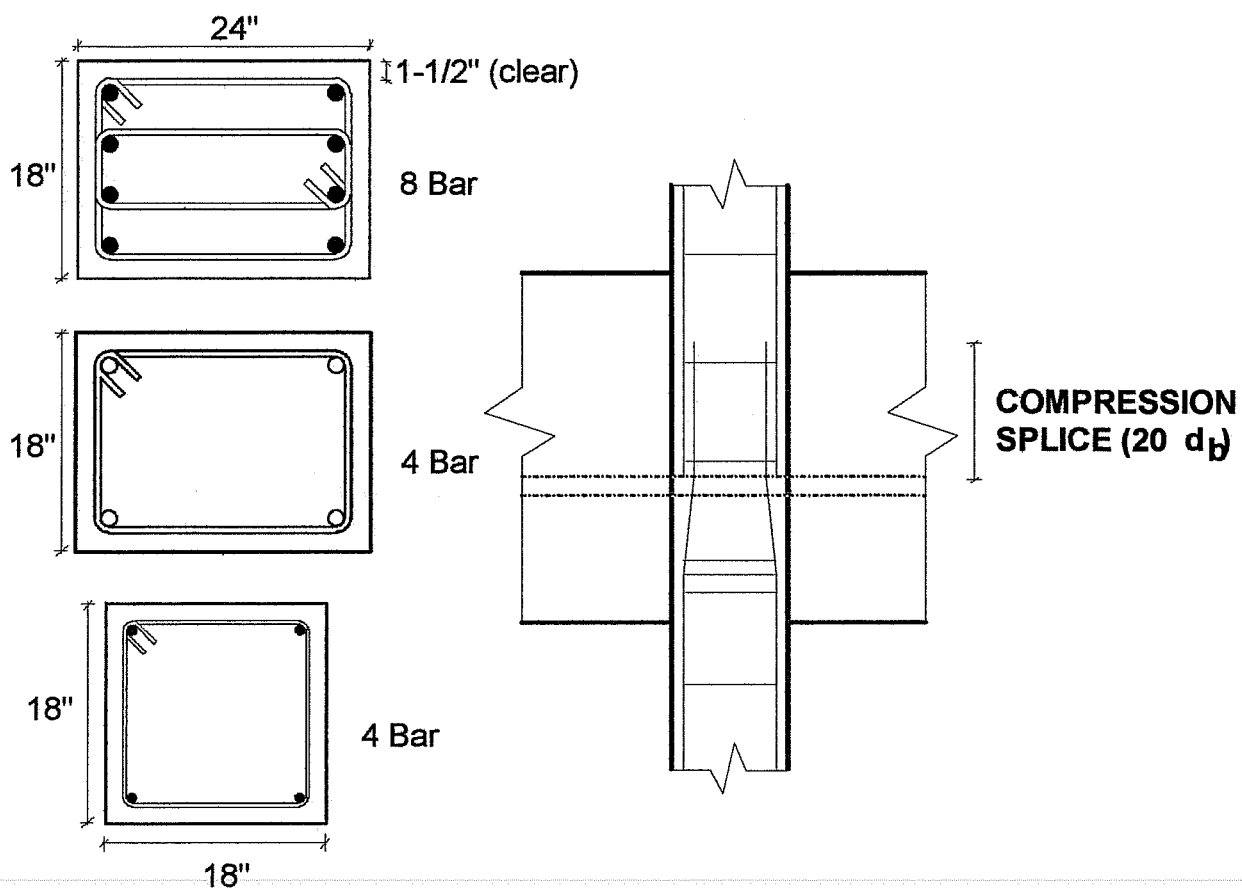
Column reinforcing schedule and details for the 7-story building.
